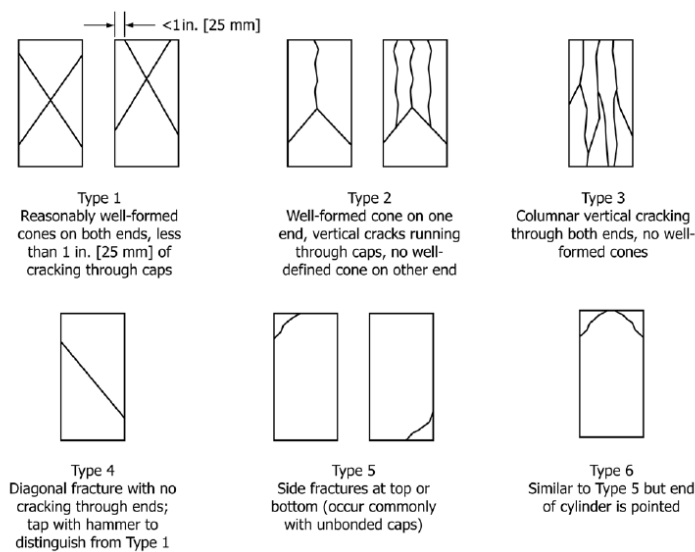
Fracture patterns in cylindrical specimens. Retrieved from ASTM C192-18.
